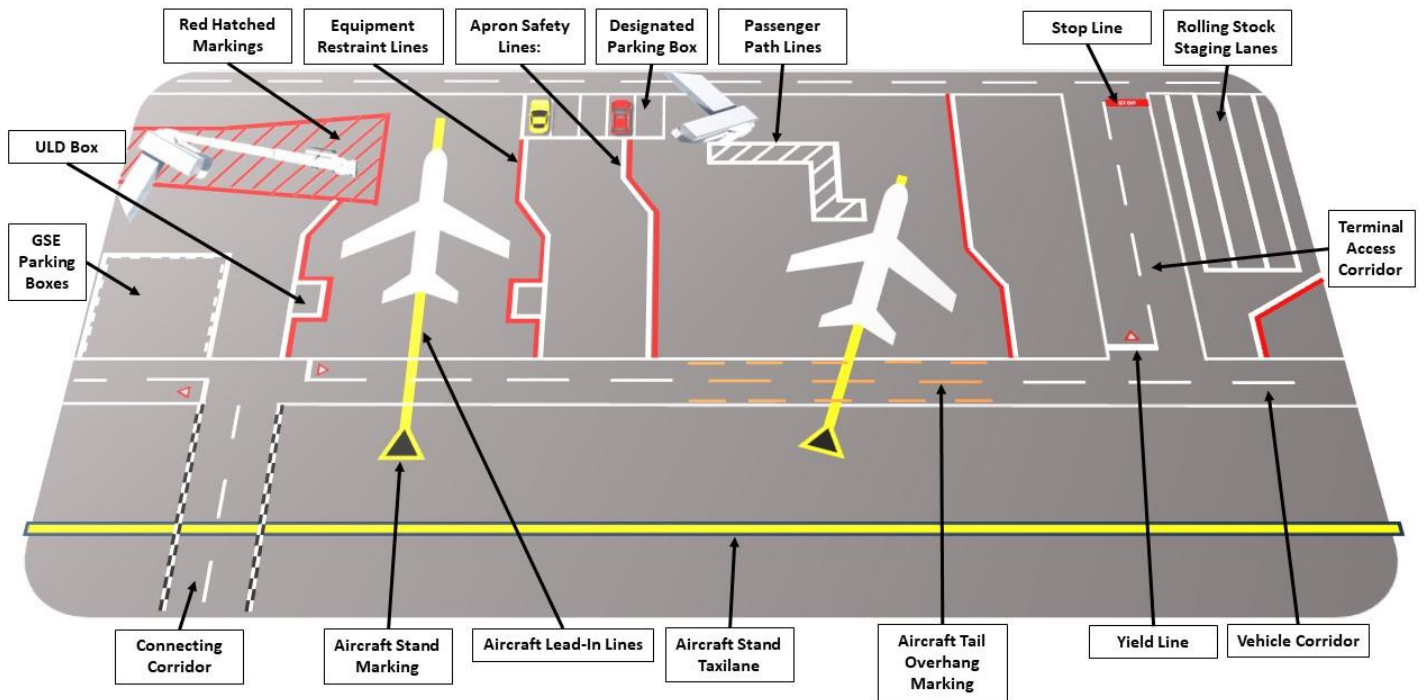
Apron markings appear as shown. Universal Load Devices (ULD) parked in lower deck ULD boxes must comply with the 7 ft. clearance requirement.
